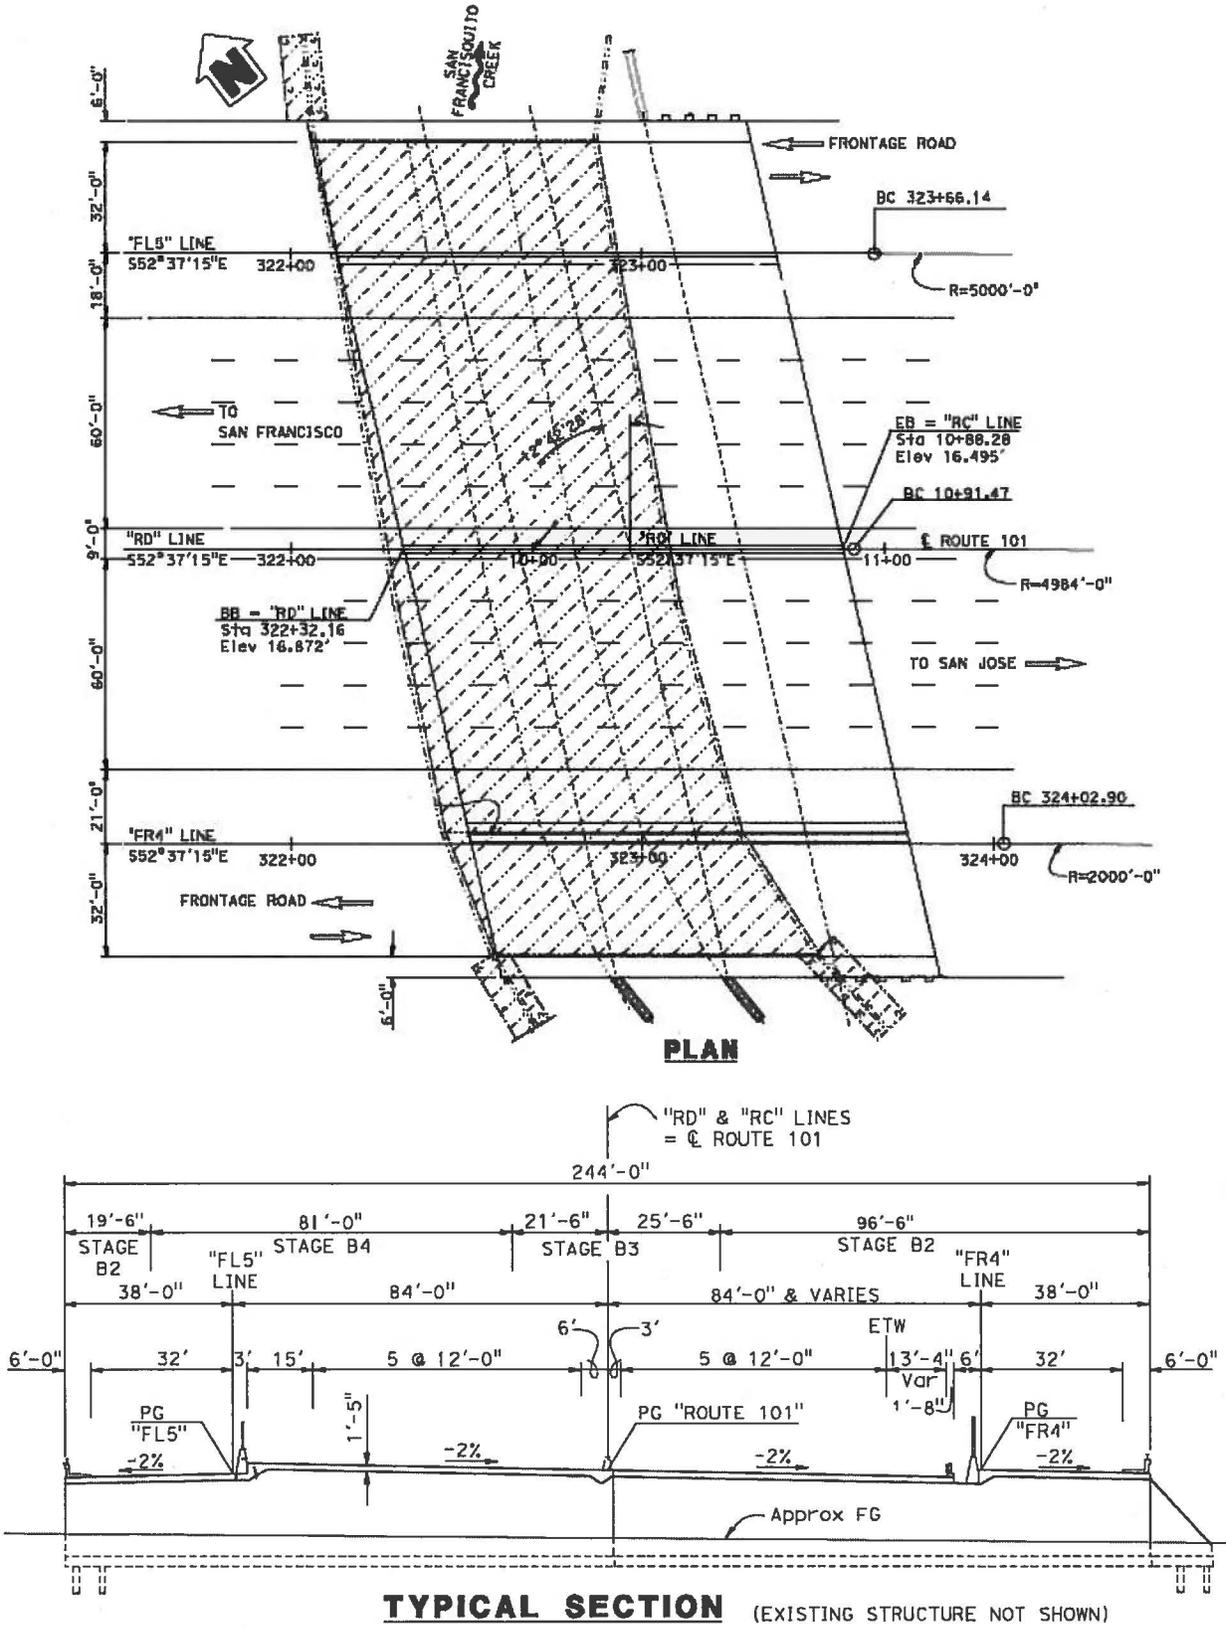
Plan View and Typical Section of Proposed San Francisquito Creek Bridge
